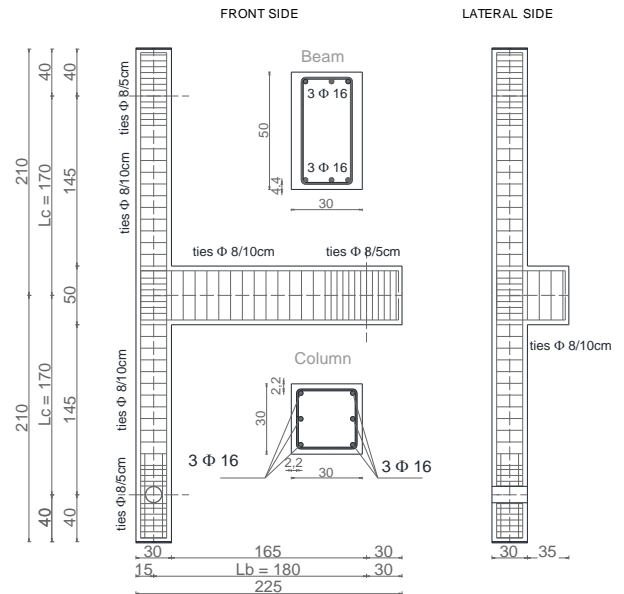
Geometry and reinforcement details (of the specimen with stirrups in the joint panel).
